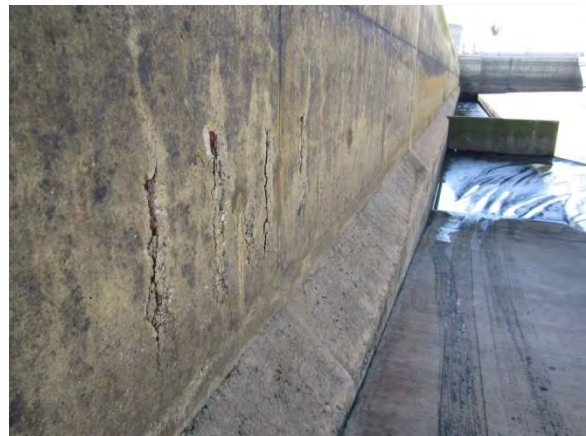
Spalling on east wall near bottom of ramp.
